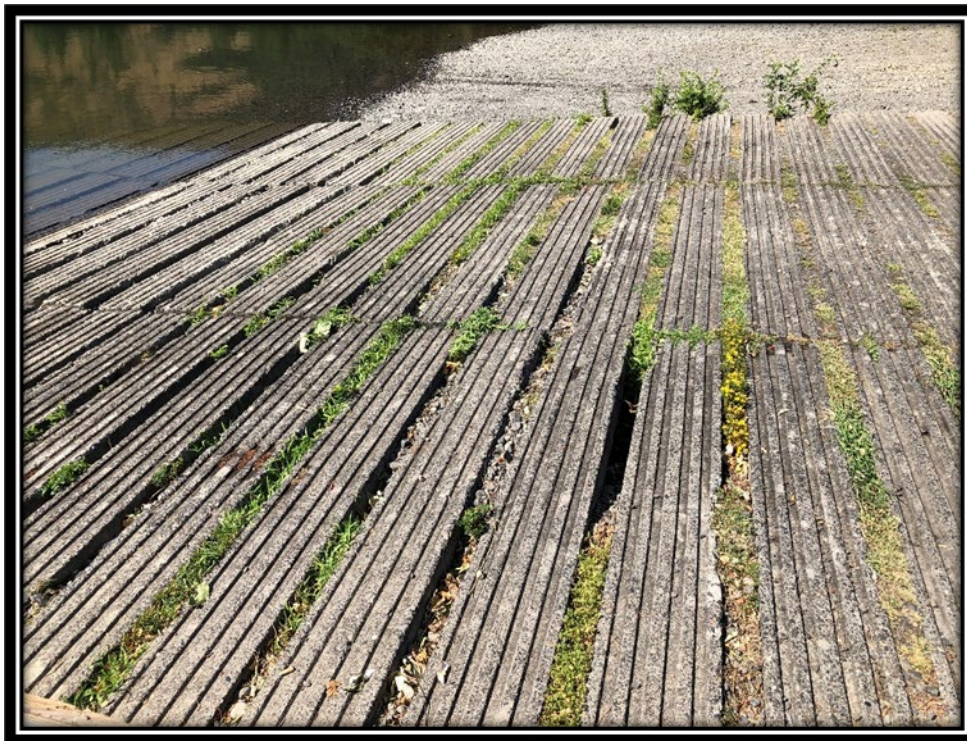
Boat ramp is constructed using concrete skip planking and has exceeded its useful life
